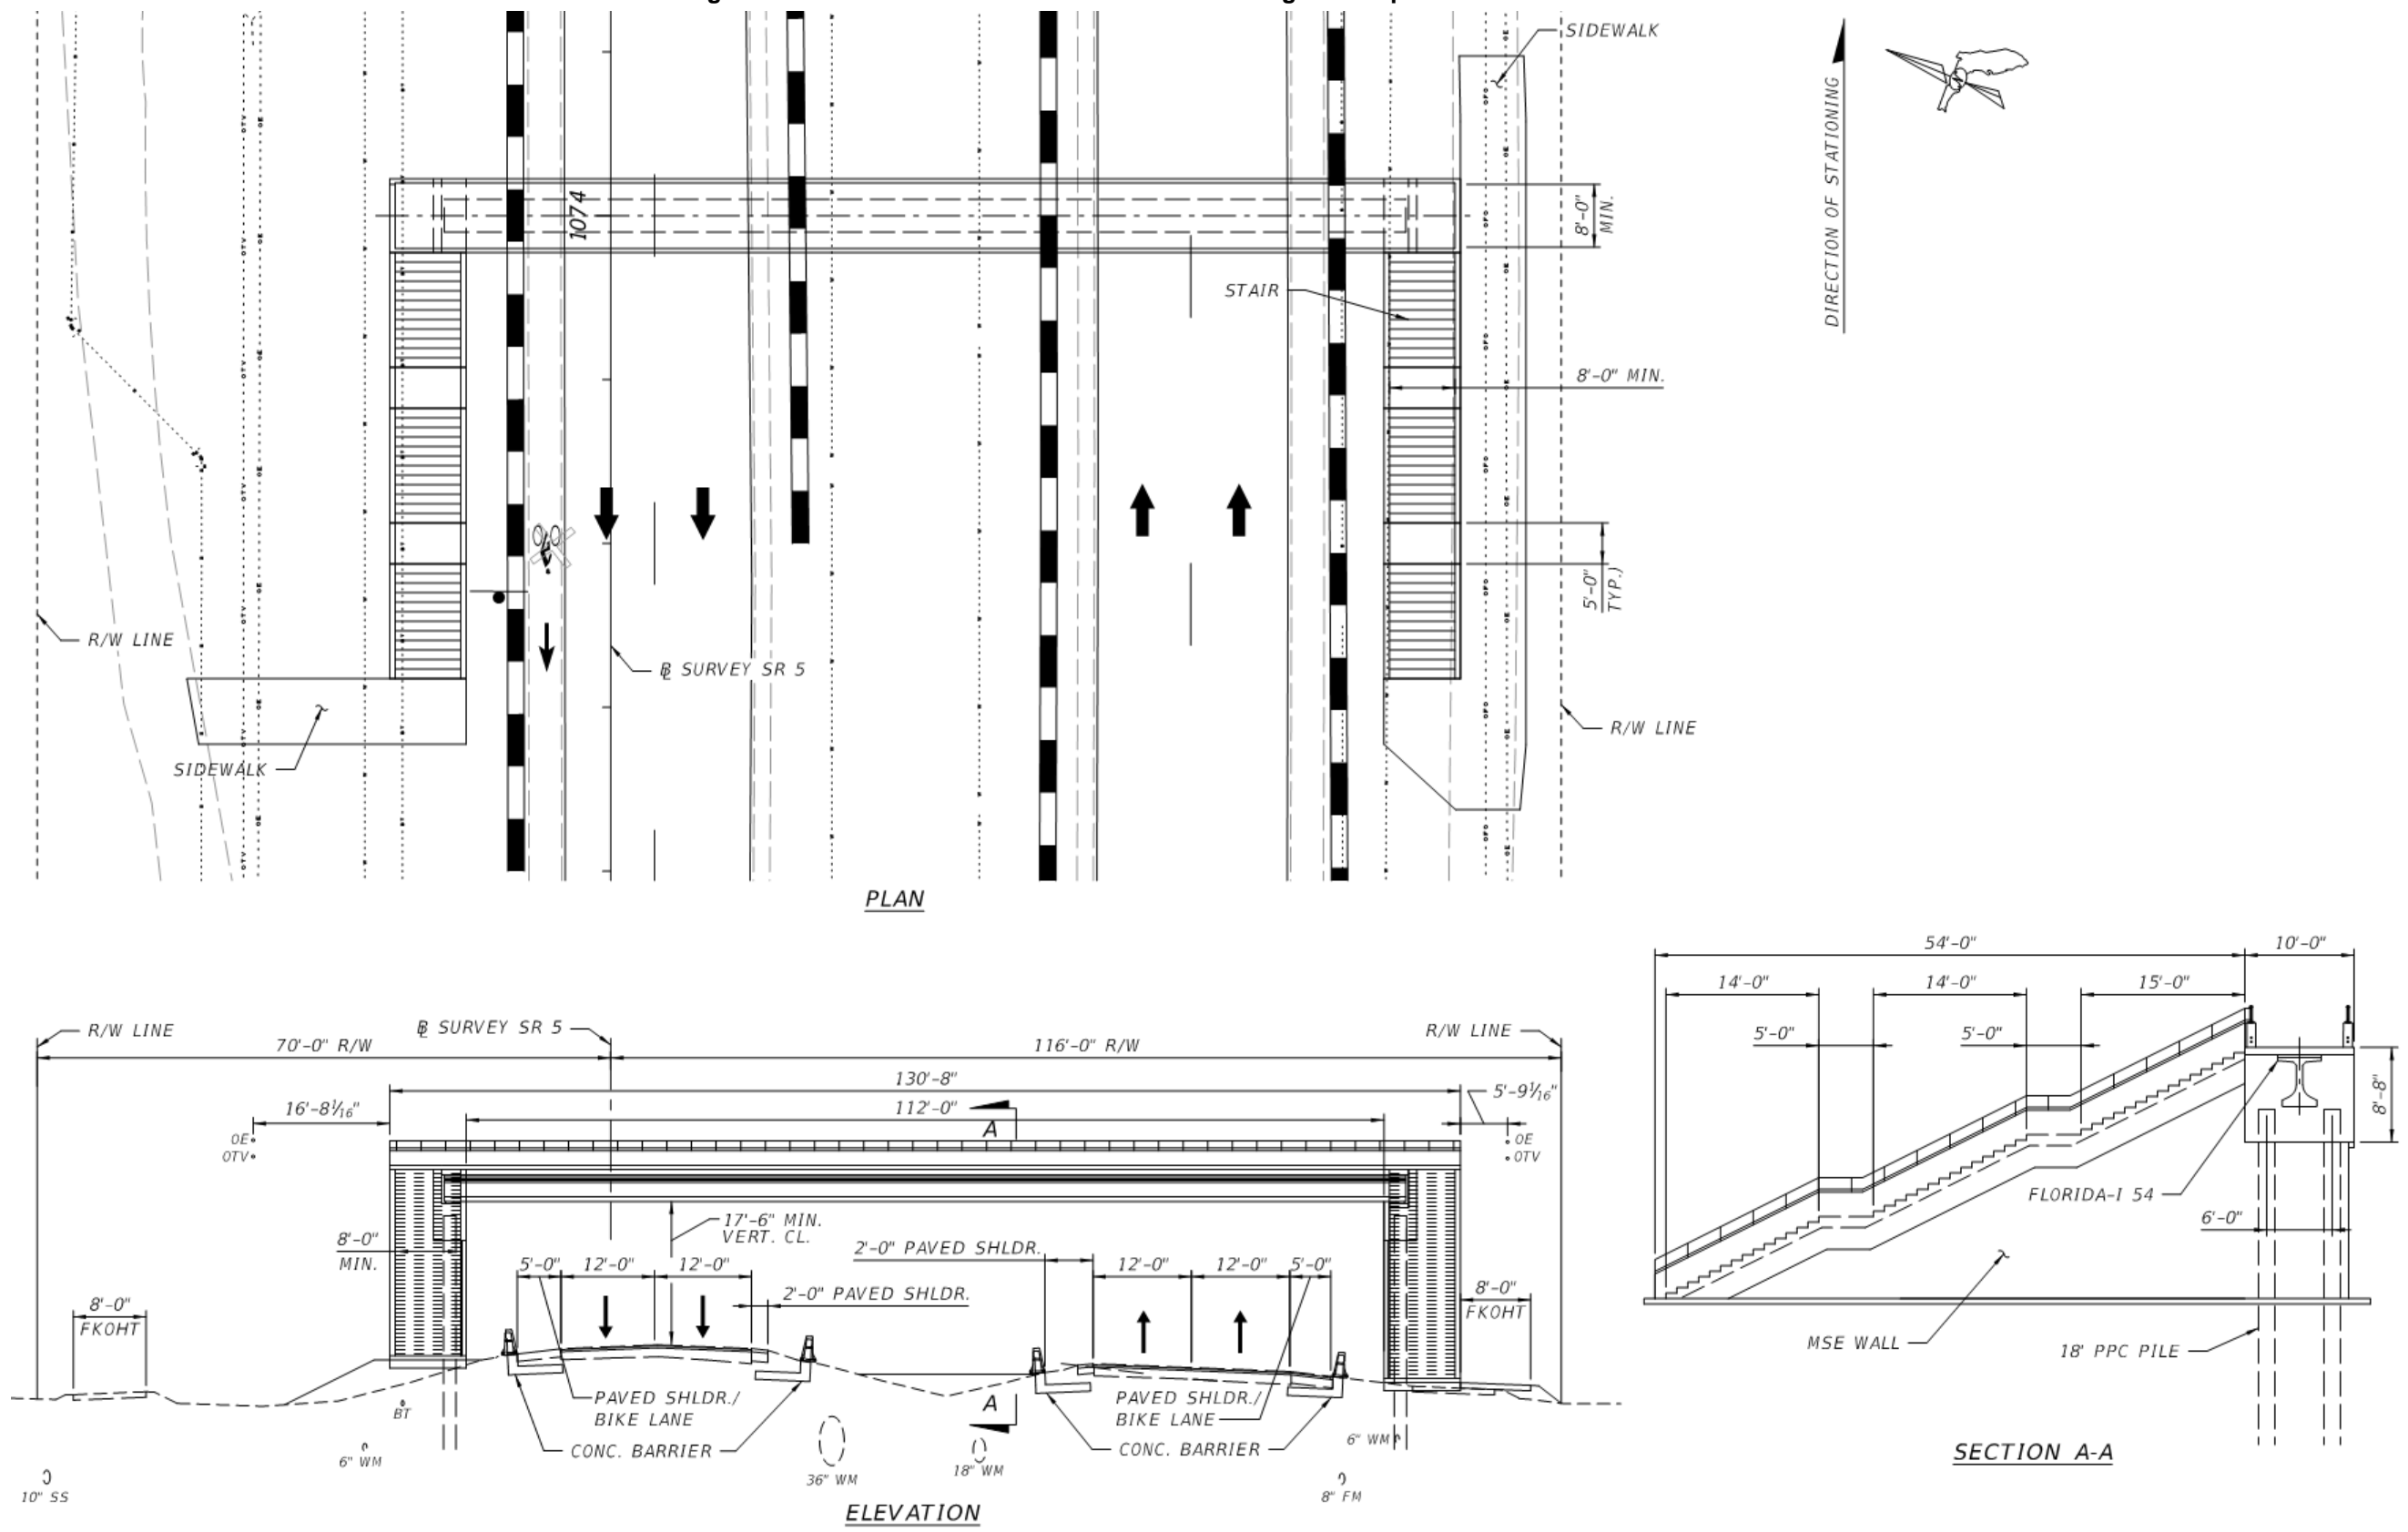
Location 3 Permanent Pedestrian Bridge Concept – Structural Plan & Elevation
